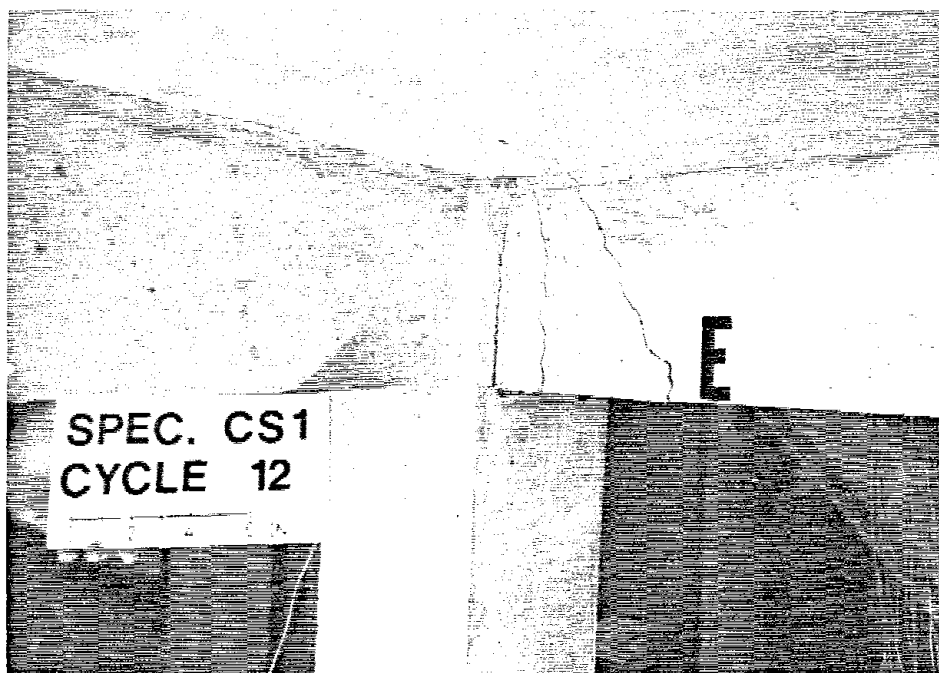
(b) Flexural Cracks in Specimen CS1
